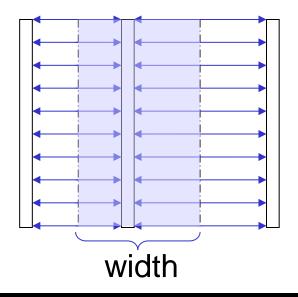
, 1.1b Structural loading diagram of an architectural condition
